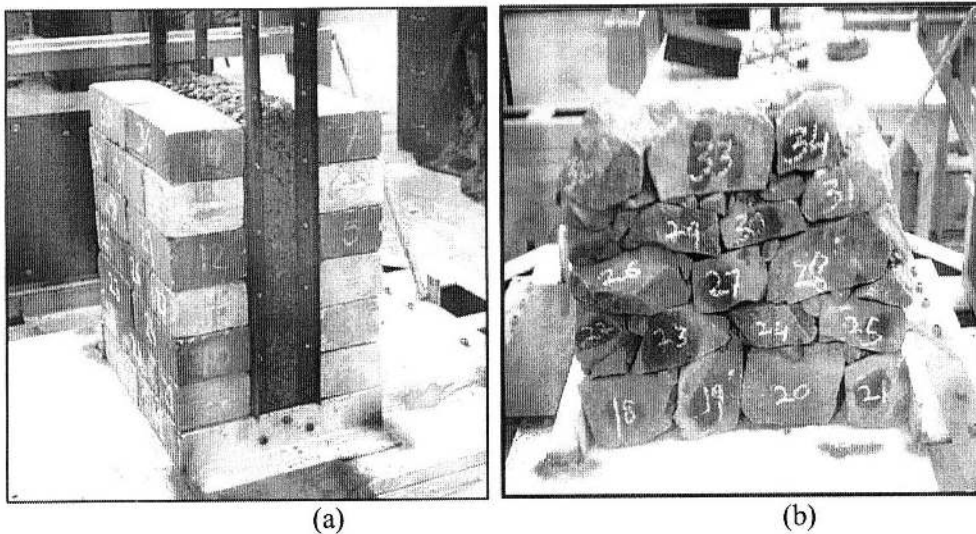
a) Brick wall with transparent infill boundary; b) typical stone wall.
